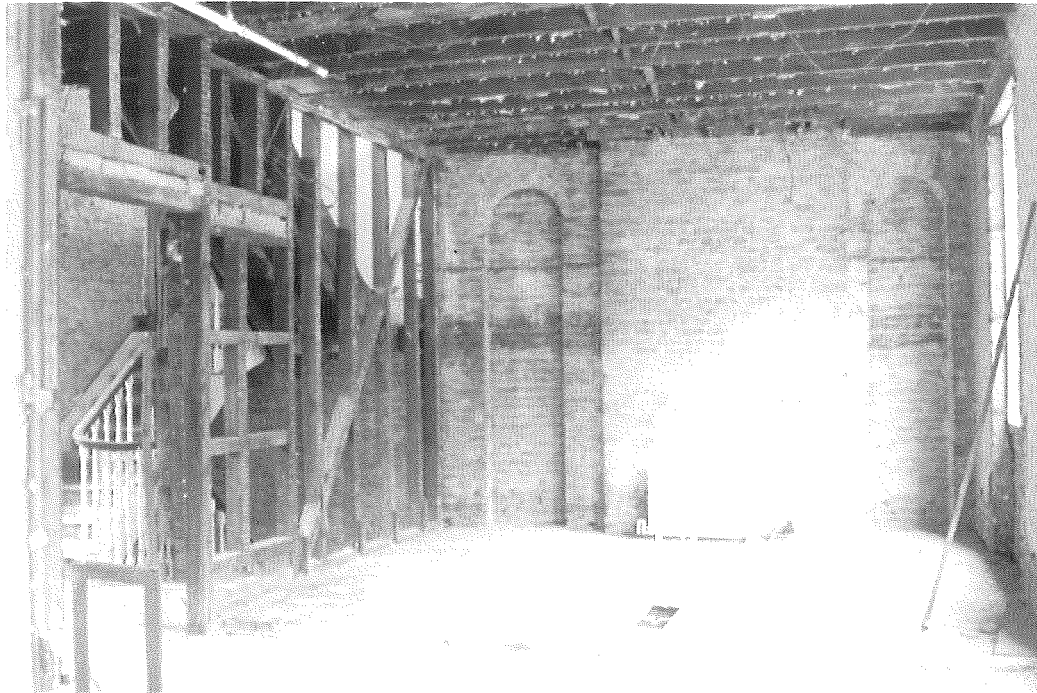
Interior, first floor, looking towards staircase (southeast)
